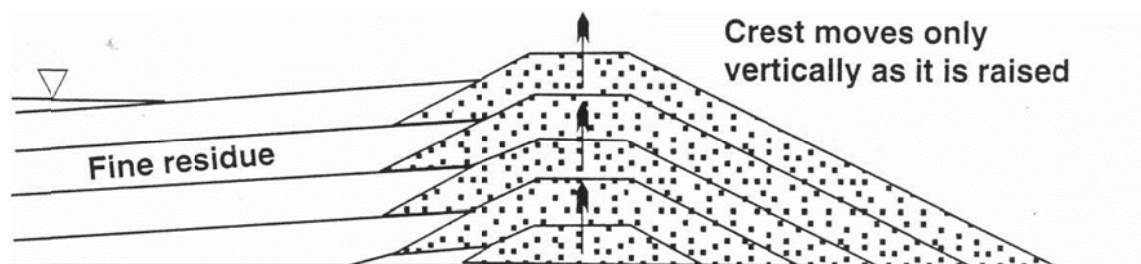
Section through a wall constructed centreline (CMSA, 1996)
